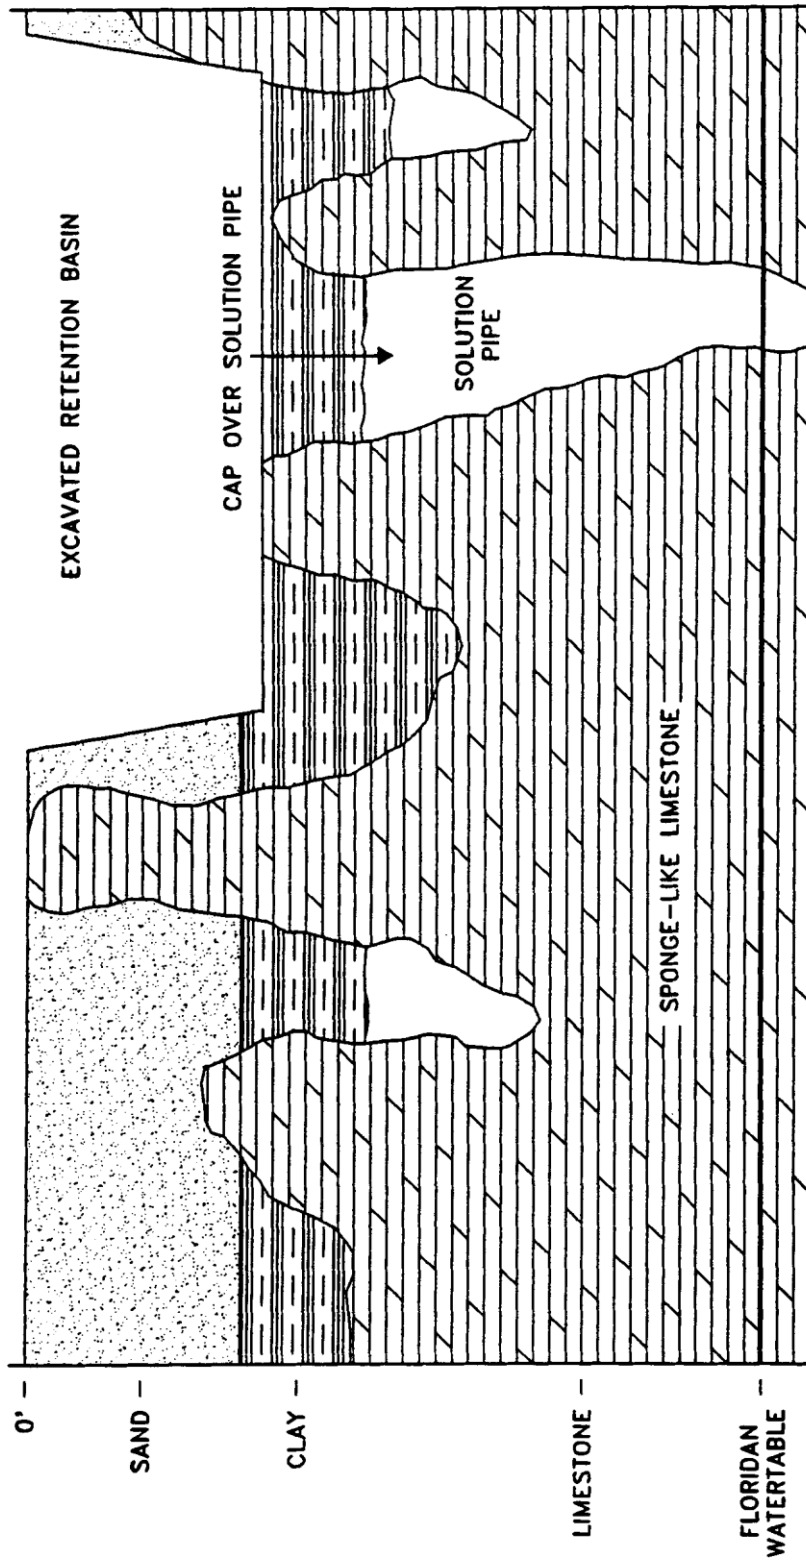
Retention pond added to Figure 6.2-1.
